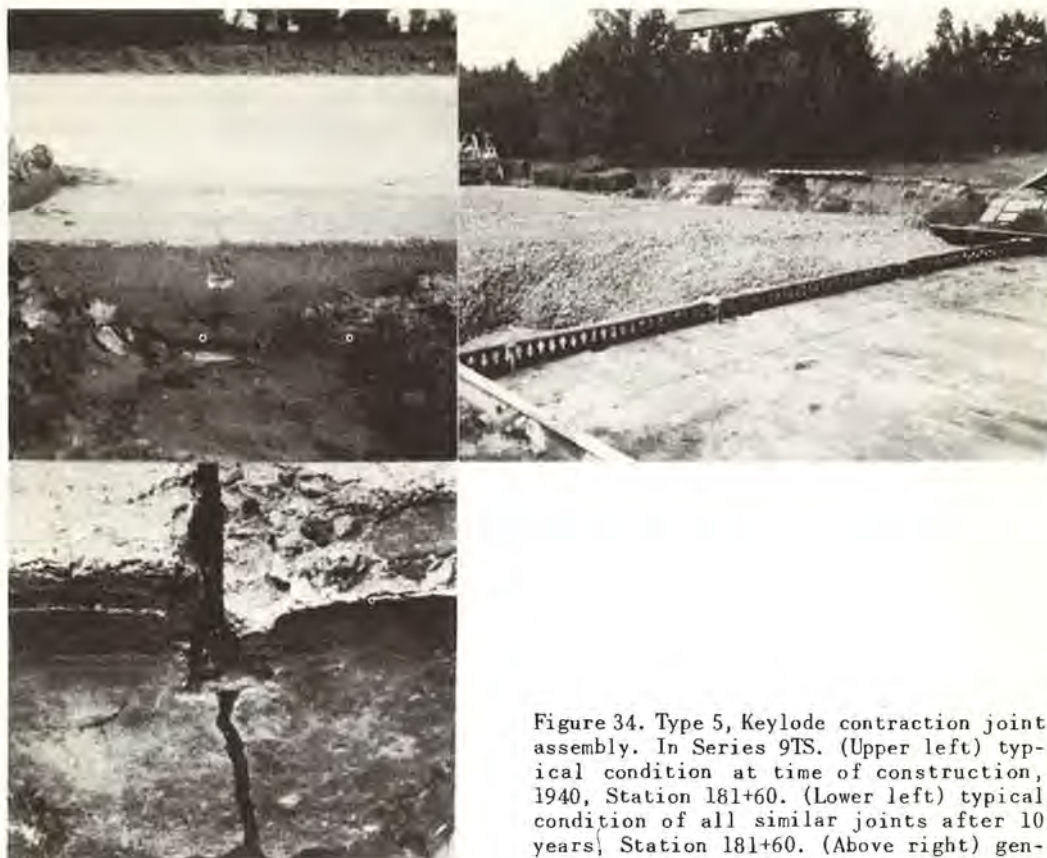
Type 5, Keyhole contraction joint assembly. In Series 9TS. (Upper left) typical condition at time of construction, 1940, Station 181+60. (Lower left) typical condition of all similar joints after 10 years, Station 181+60. (Above right) general view of joint assembly.
